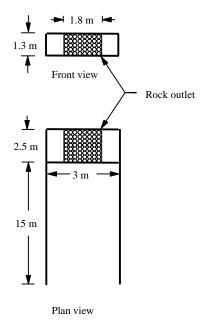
Plan and front (looking upstream) views of the Woodsong trap.
